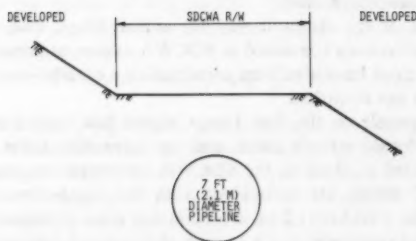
Typical Section with Slope Banks Starting at Right-of-Way Lines; Buildings for Home or Business Can Also Abut Easement with No Setback Requirement
